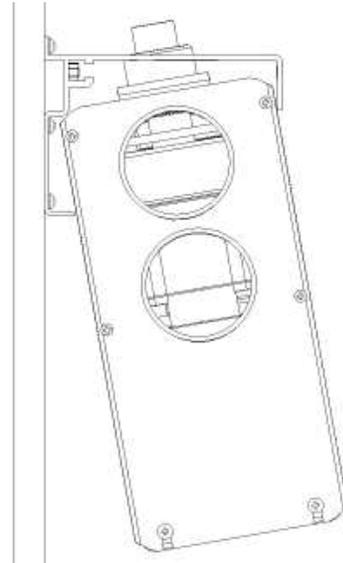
Locking the furnace in place with two M8 x 120 locking bolts.
